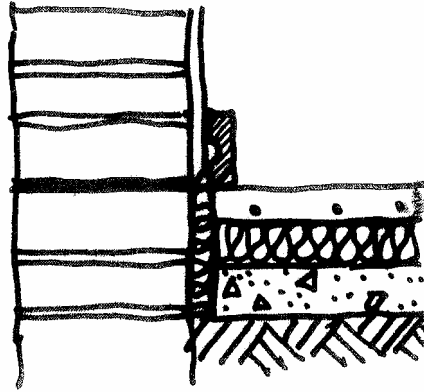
Low-mass screed contains heating elements on top floor insulation – Note perimeter insulation
